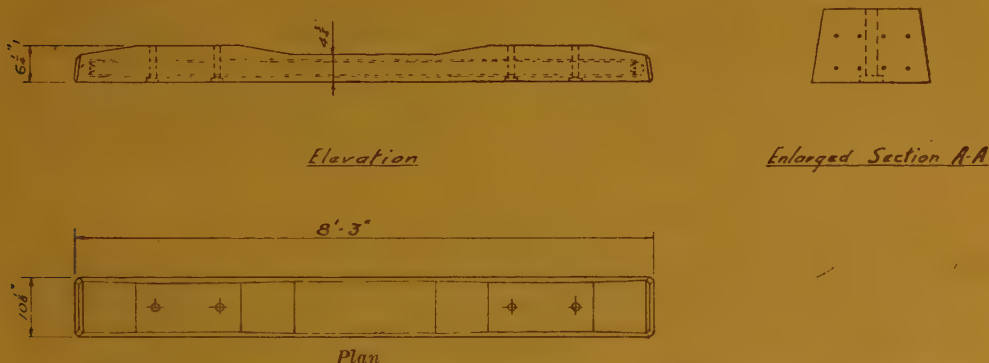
Pre-stressed concrete sleeper with positive anchorage. British Railways.
